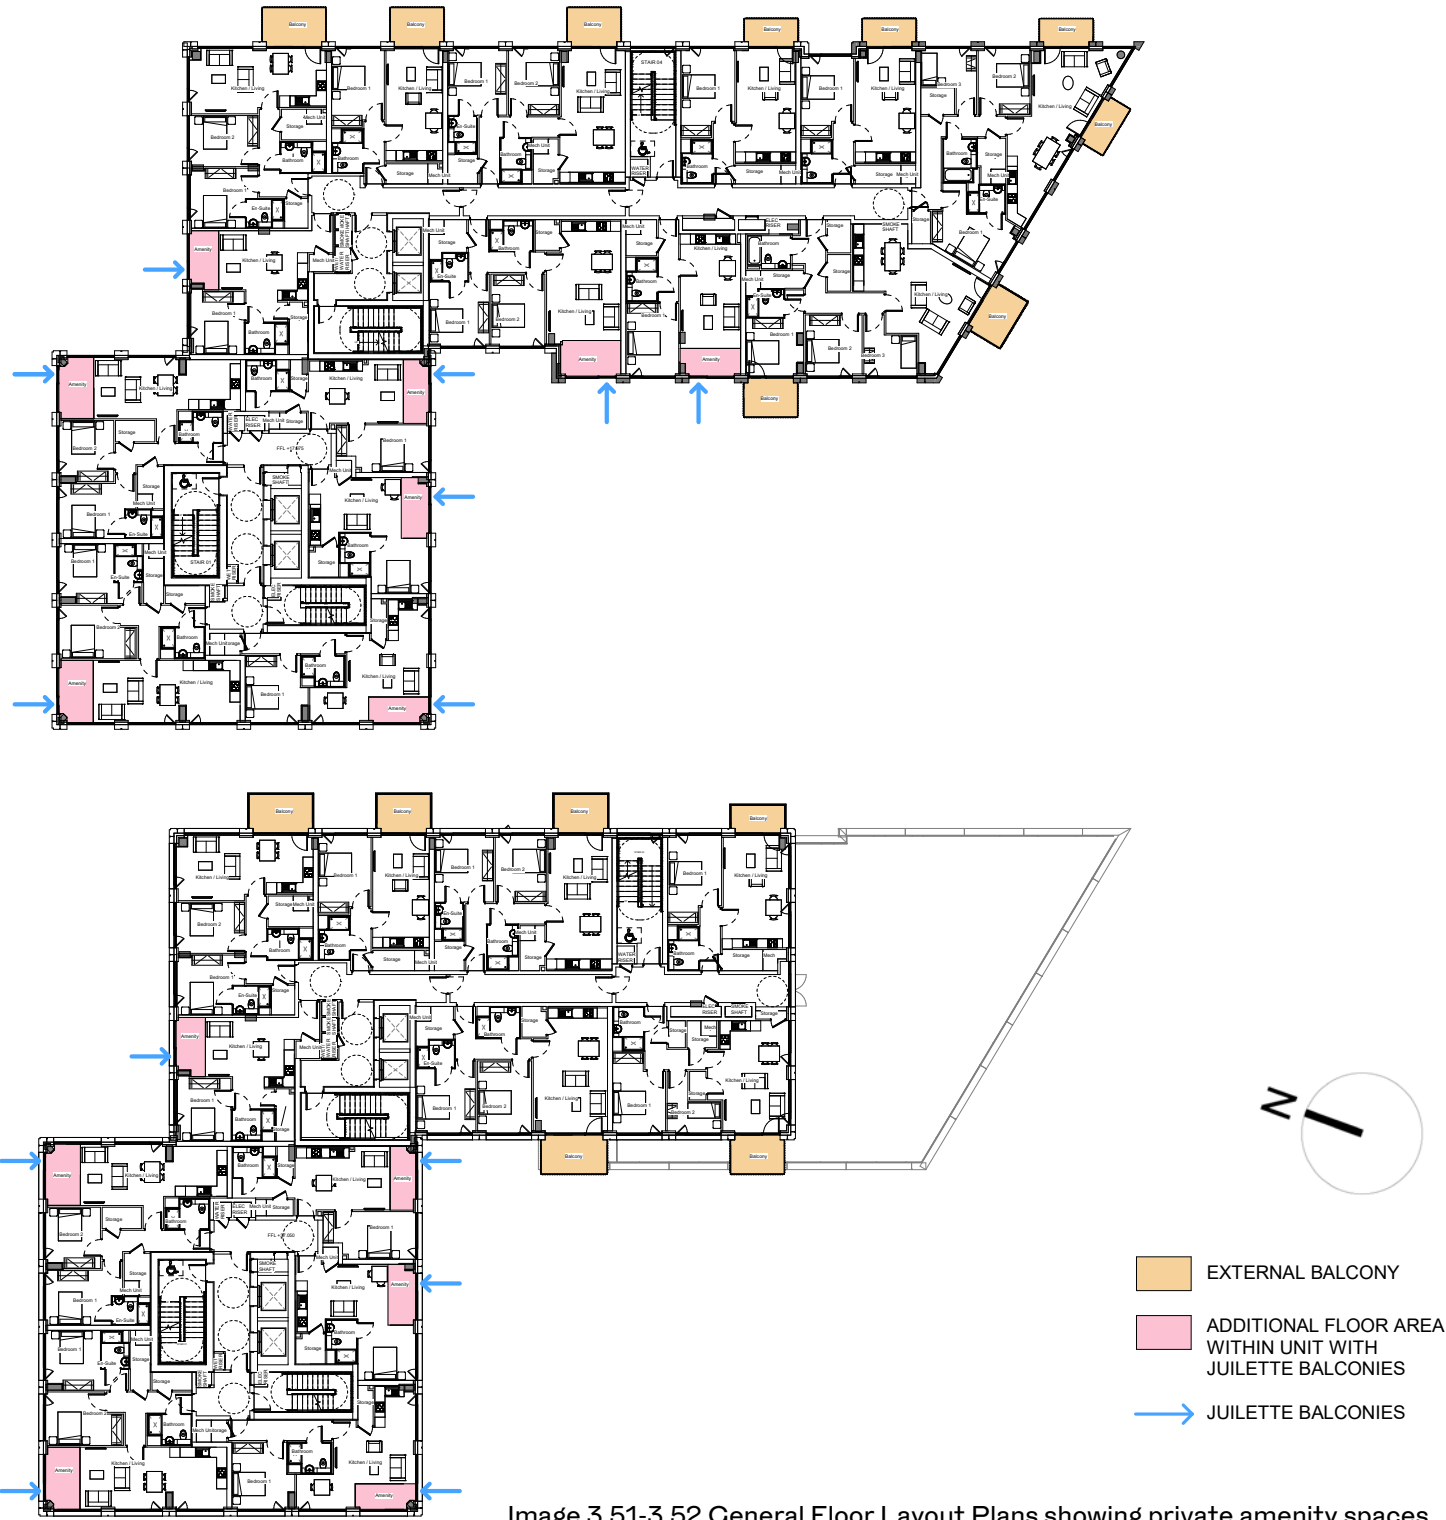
General Floor Layout Plans showing private amenity spaces
